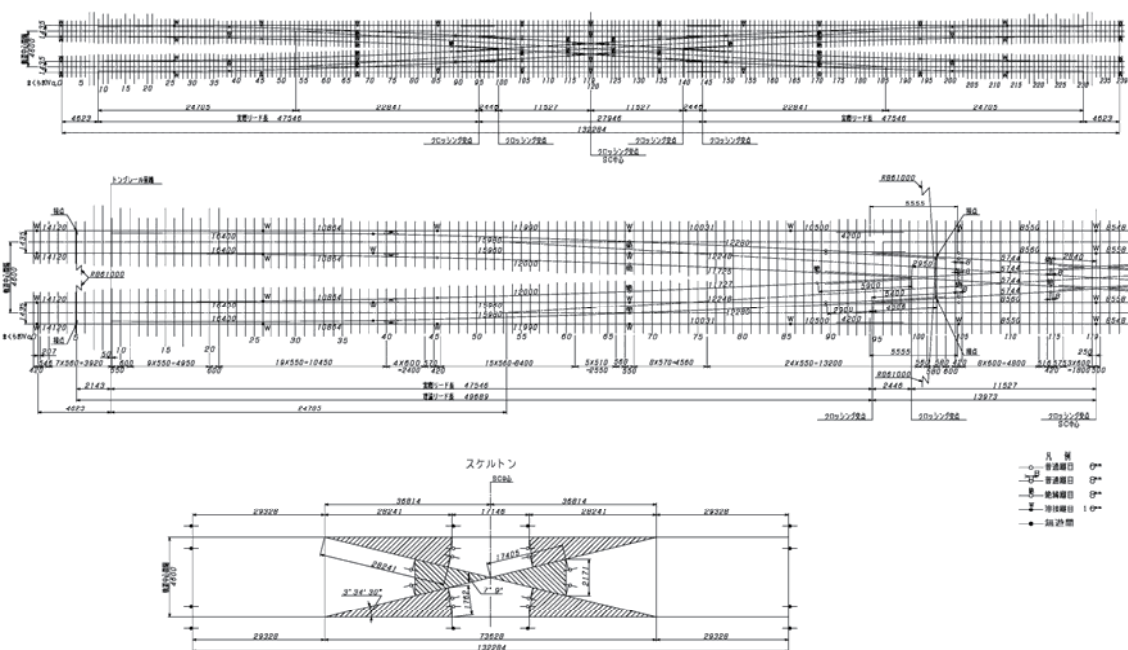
Drawing of Scissors Crossing Turnout SC-No.16.
